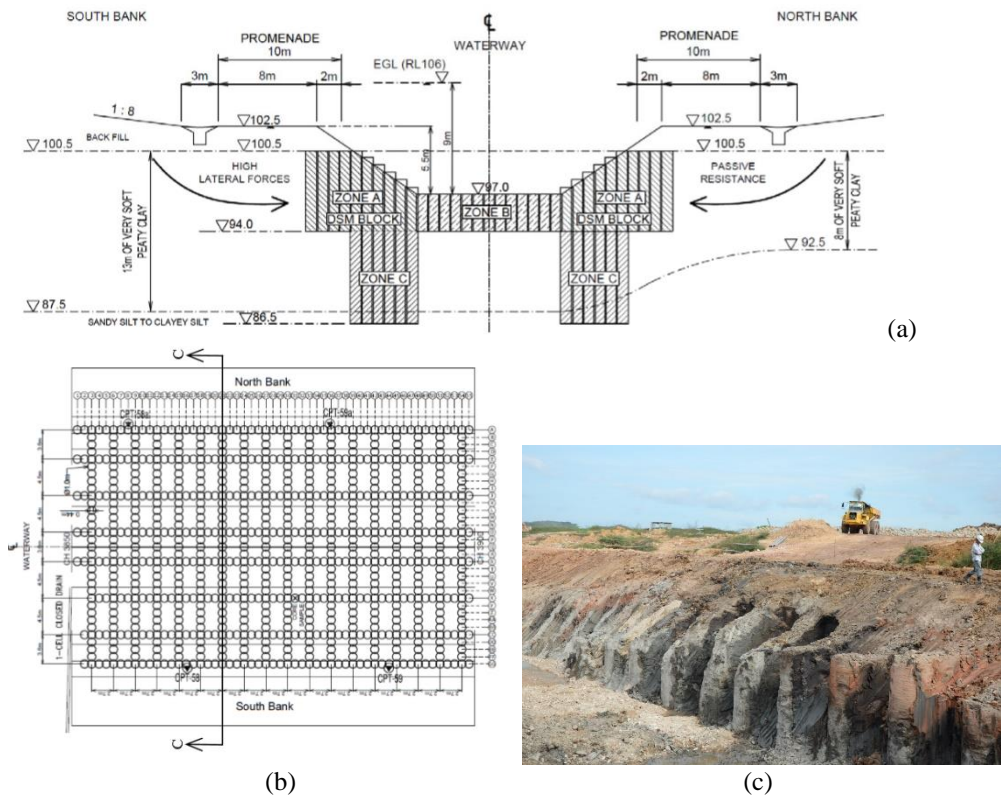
(a) Cross-section of DSM columns at C-C section, (b) Plan view of DSM columns for temporary condition at CH3850-3900 (after Soh et al. 2013); and (c) Picture showing installed DSM columns
